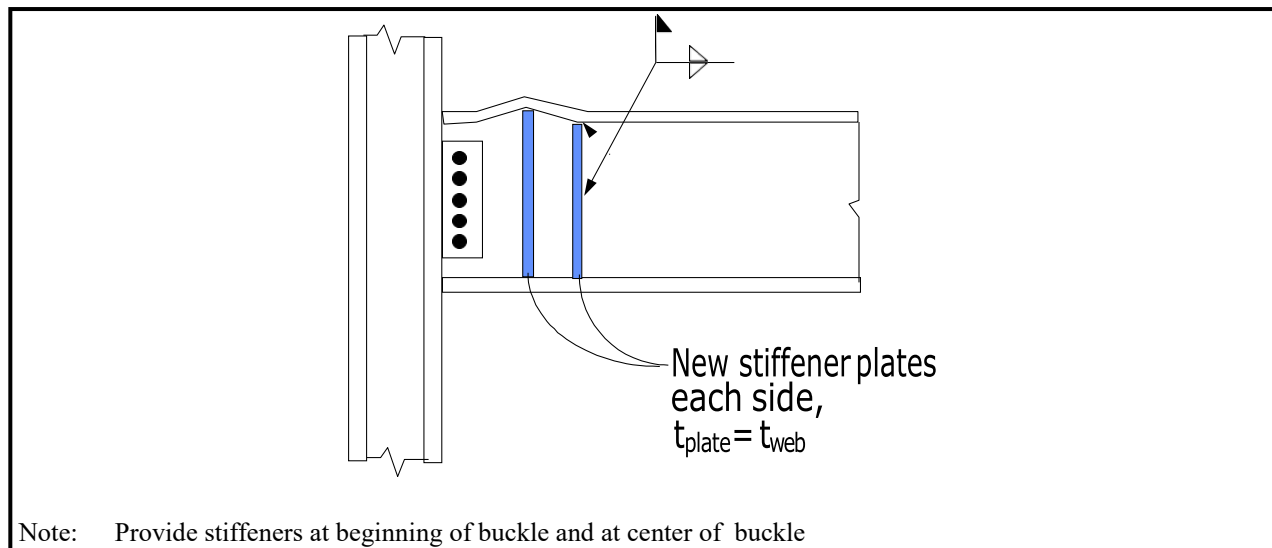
Addition of Stiffeners at Buckled Girder Flange
